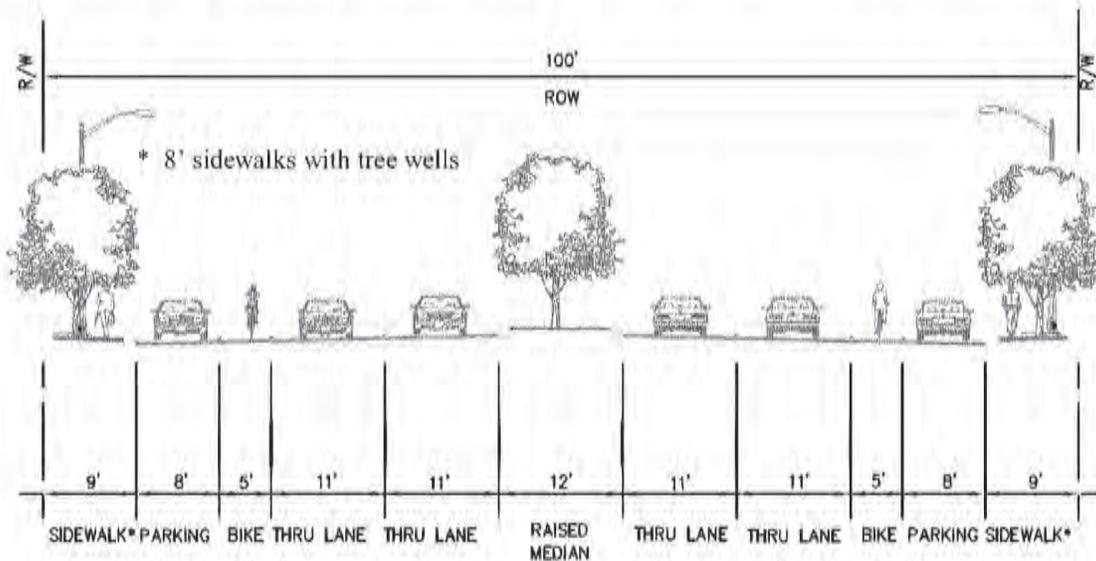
Proposed Cross Section, Broadway Between C Street and L Street
